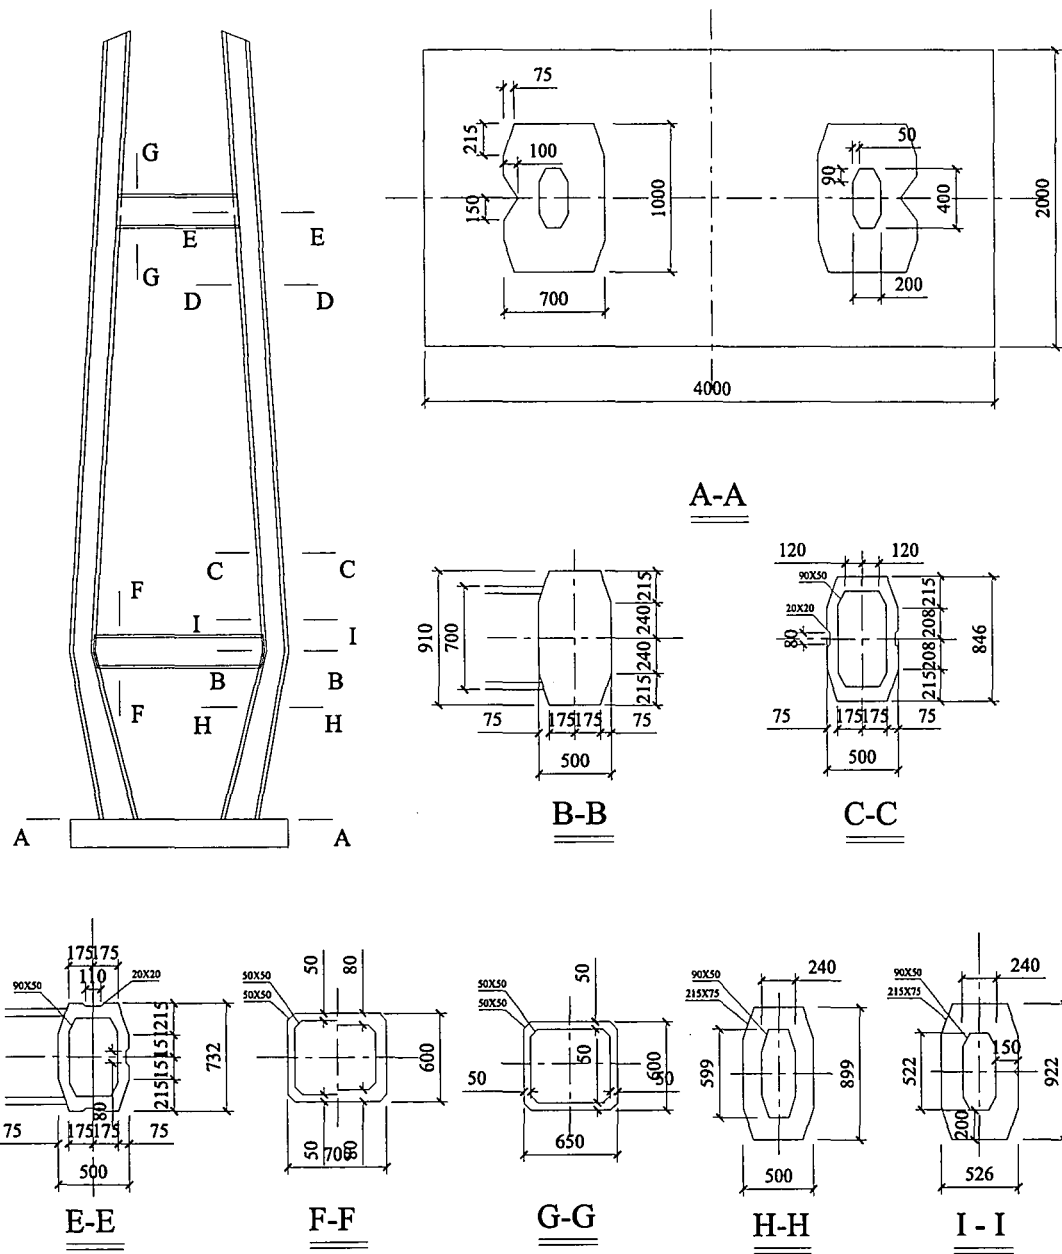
Geometry of bridge tower & selected sections (unit: cm)
